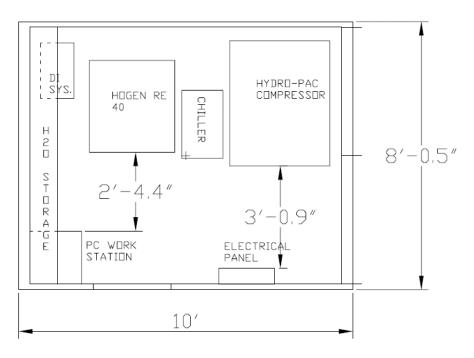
General cargo container equipment layout. Note: Dimensions are approximate, technical drawings can be found in Appendix C
